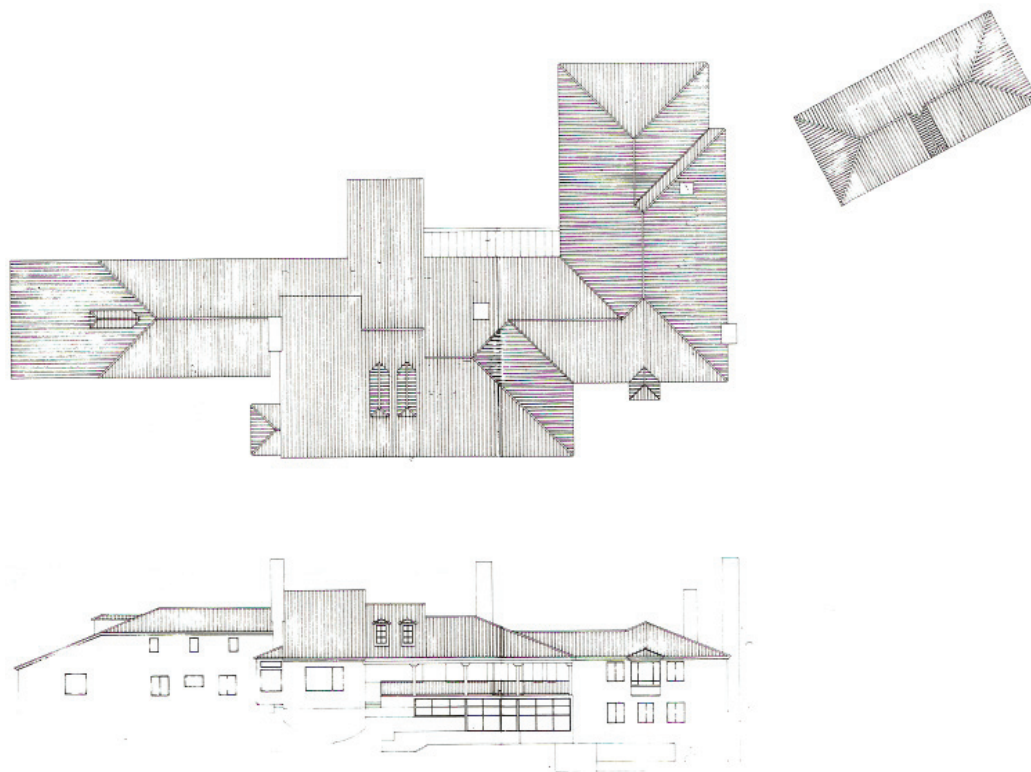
Plant roofing and elevation of house in Los Cigarrales, Toledo. Julio Cano Lasso (Cano, 1995:60).
